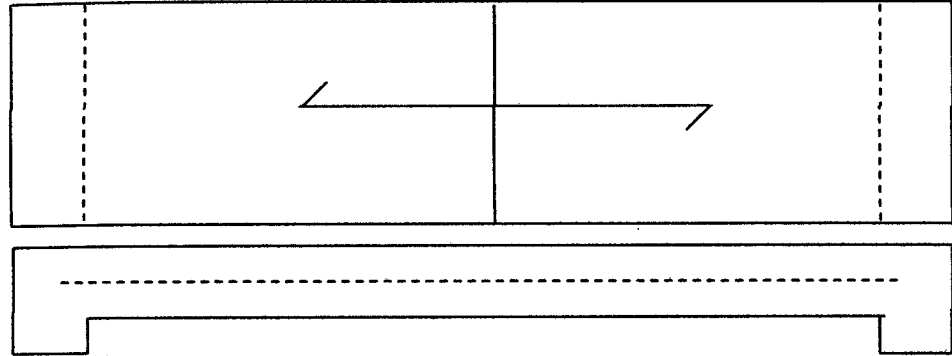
Elevation of a one-way spanning slab (supported on 2 slabs)
